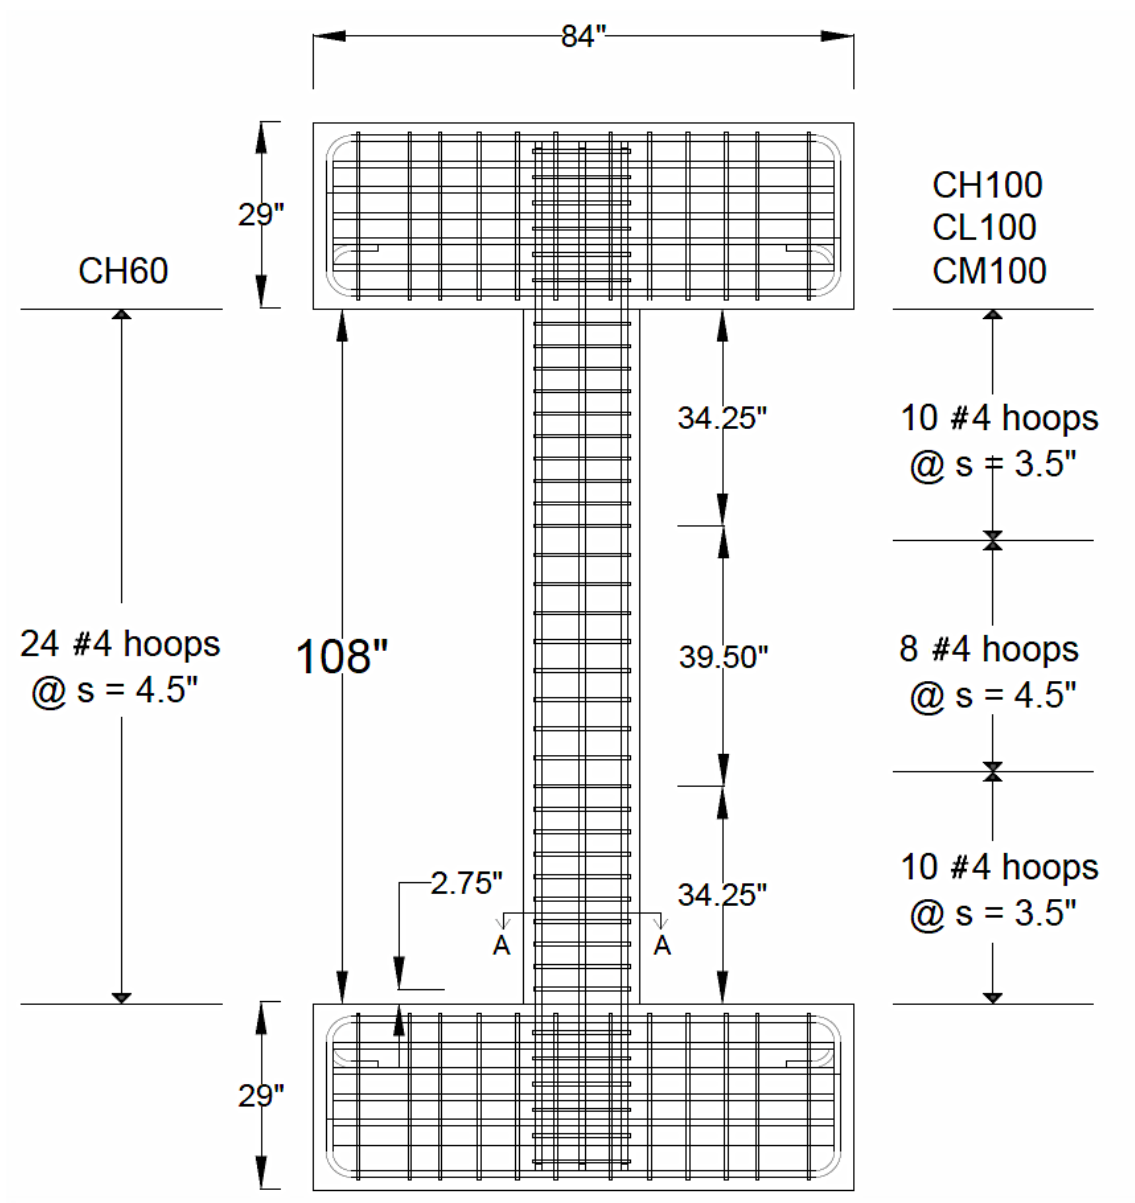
ELEVATION LAYOUT OF THE REINFORCEMENT IN TESTED SPECIMENS
